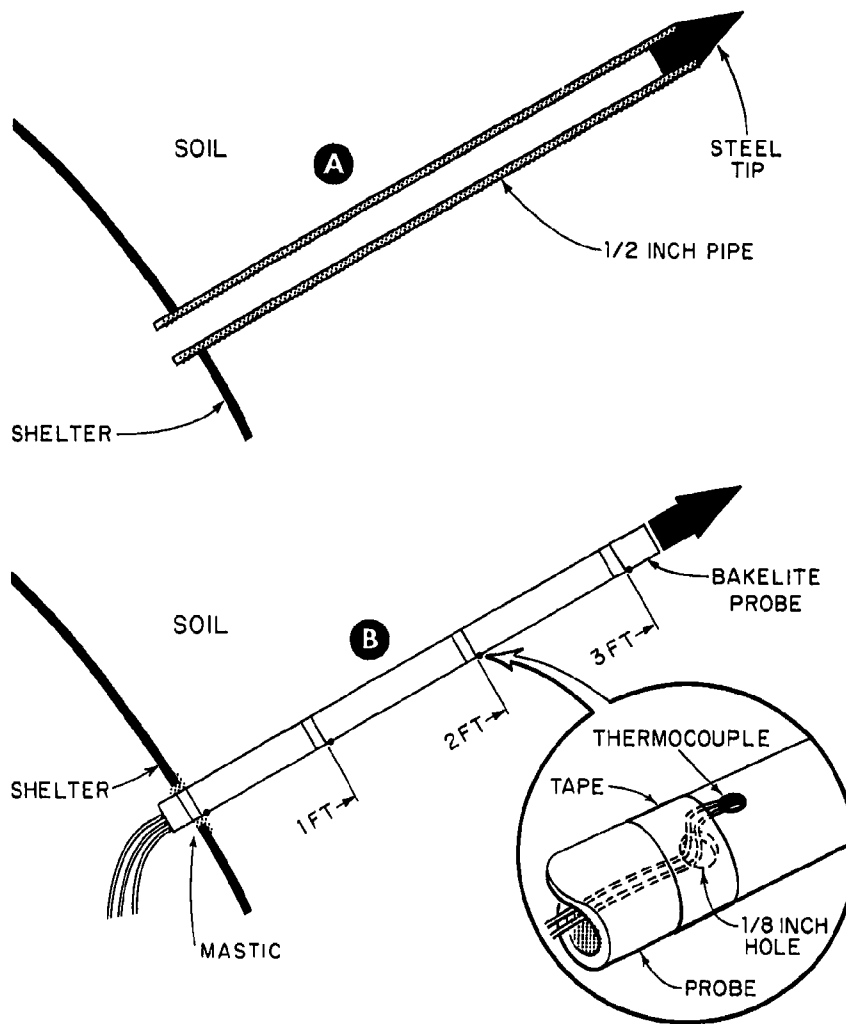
A. Pipe Driven Into Soil Prior to Inserting Thermocouple Probe
